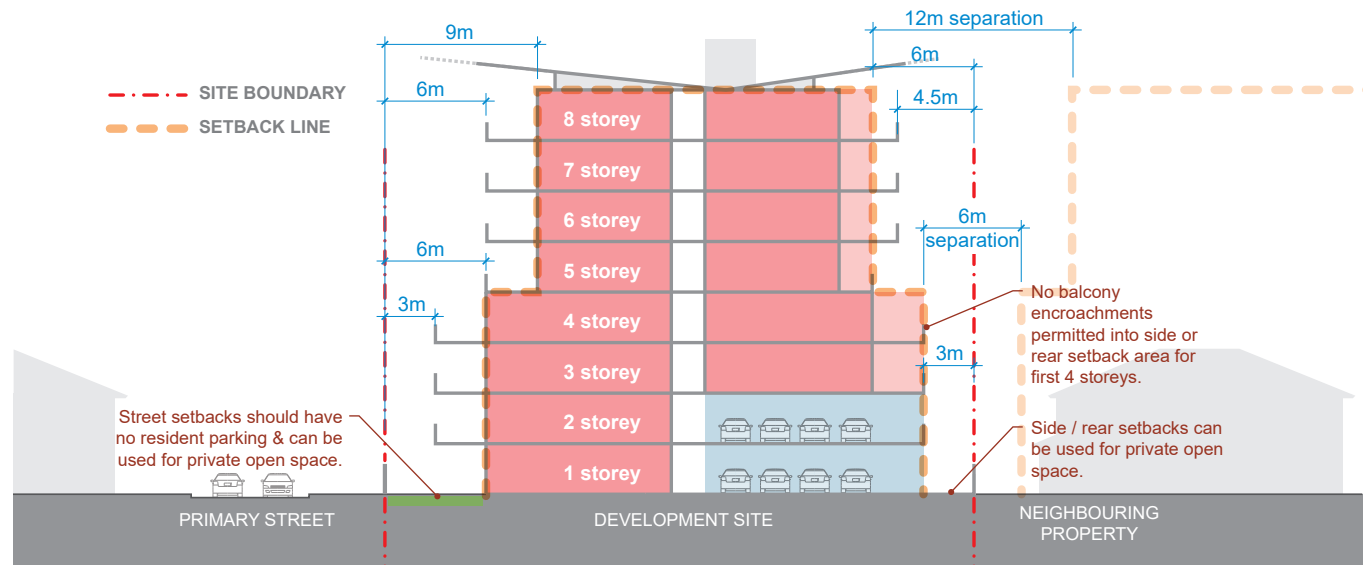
illustrates setback provisions for buildings up to 8 storeys
